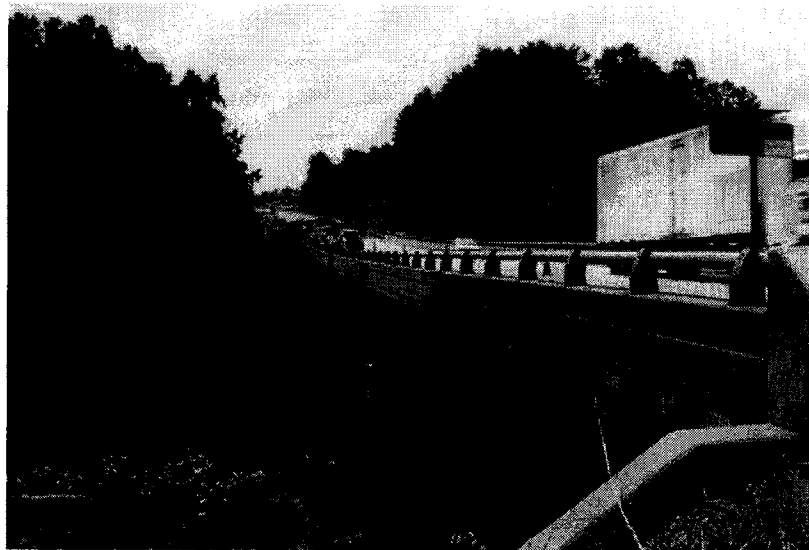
Rte. 29 northbound bridge over the Staunton River, Altavista, VA.
